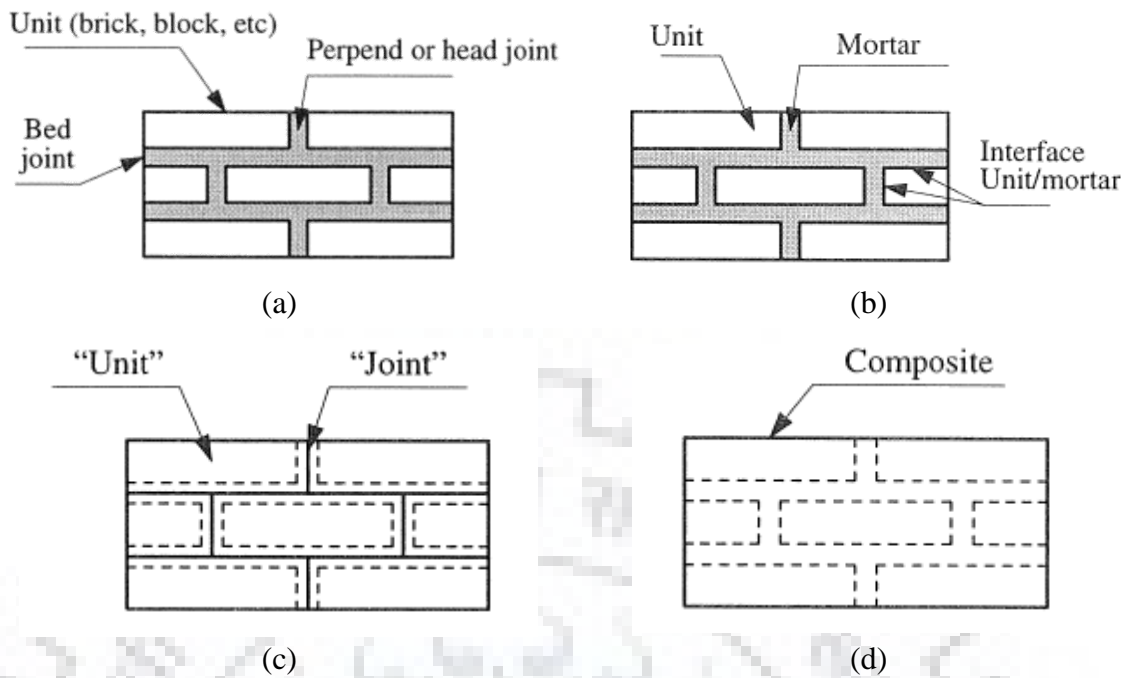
Modeling strategies for masonry: (a) Masonry sample; (b) Detailed micro modeling (discrete crack); (c) Simplified micro-modeling (discrete crack); and (d) Micro modeling (smeared crack) (Lourenco et al. 1997)
